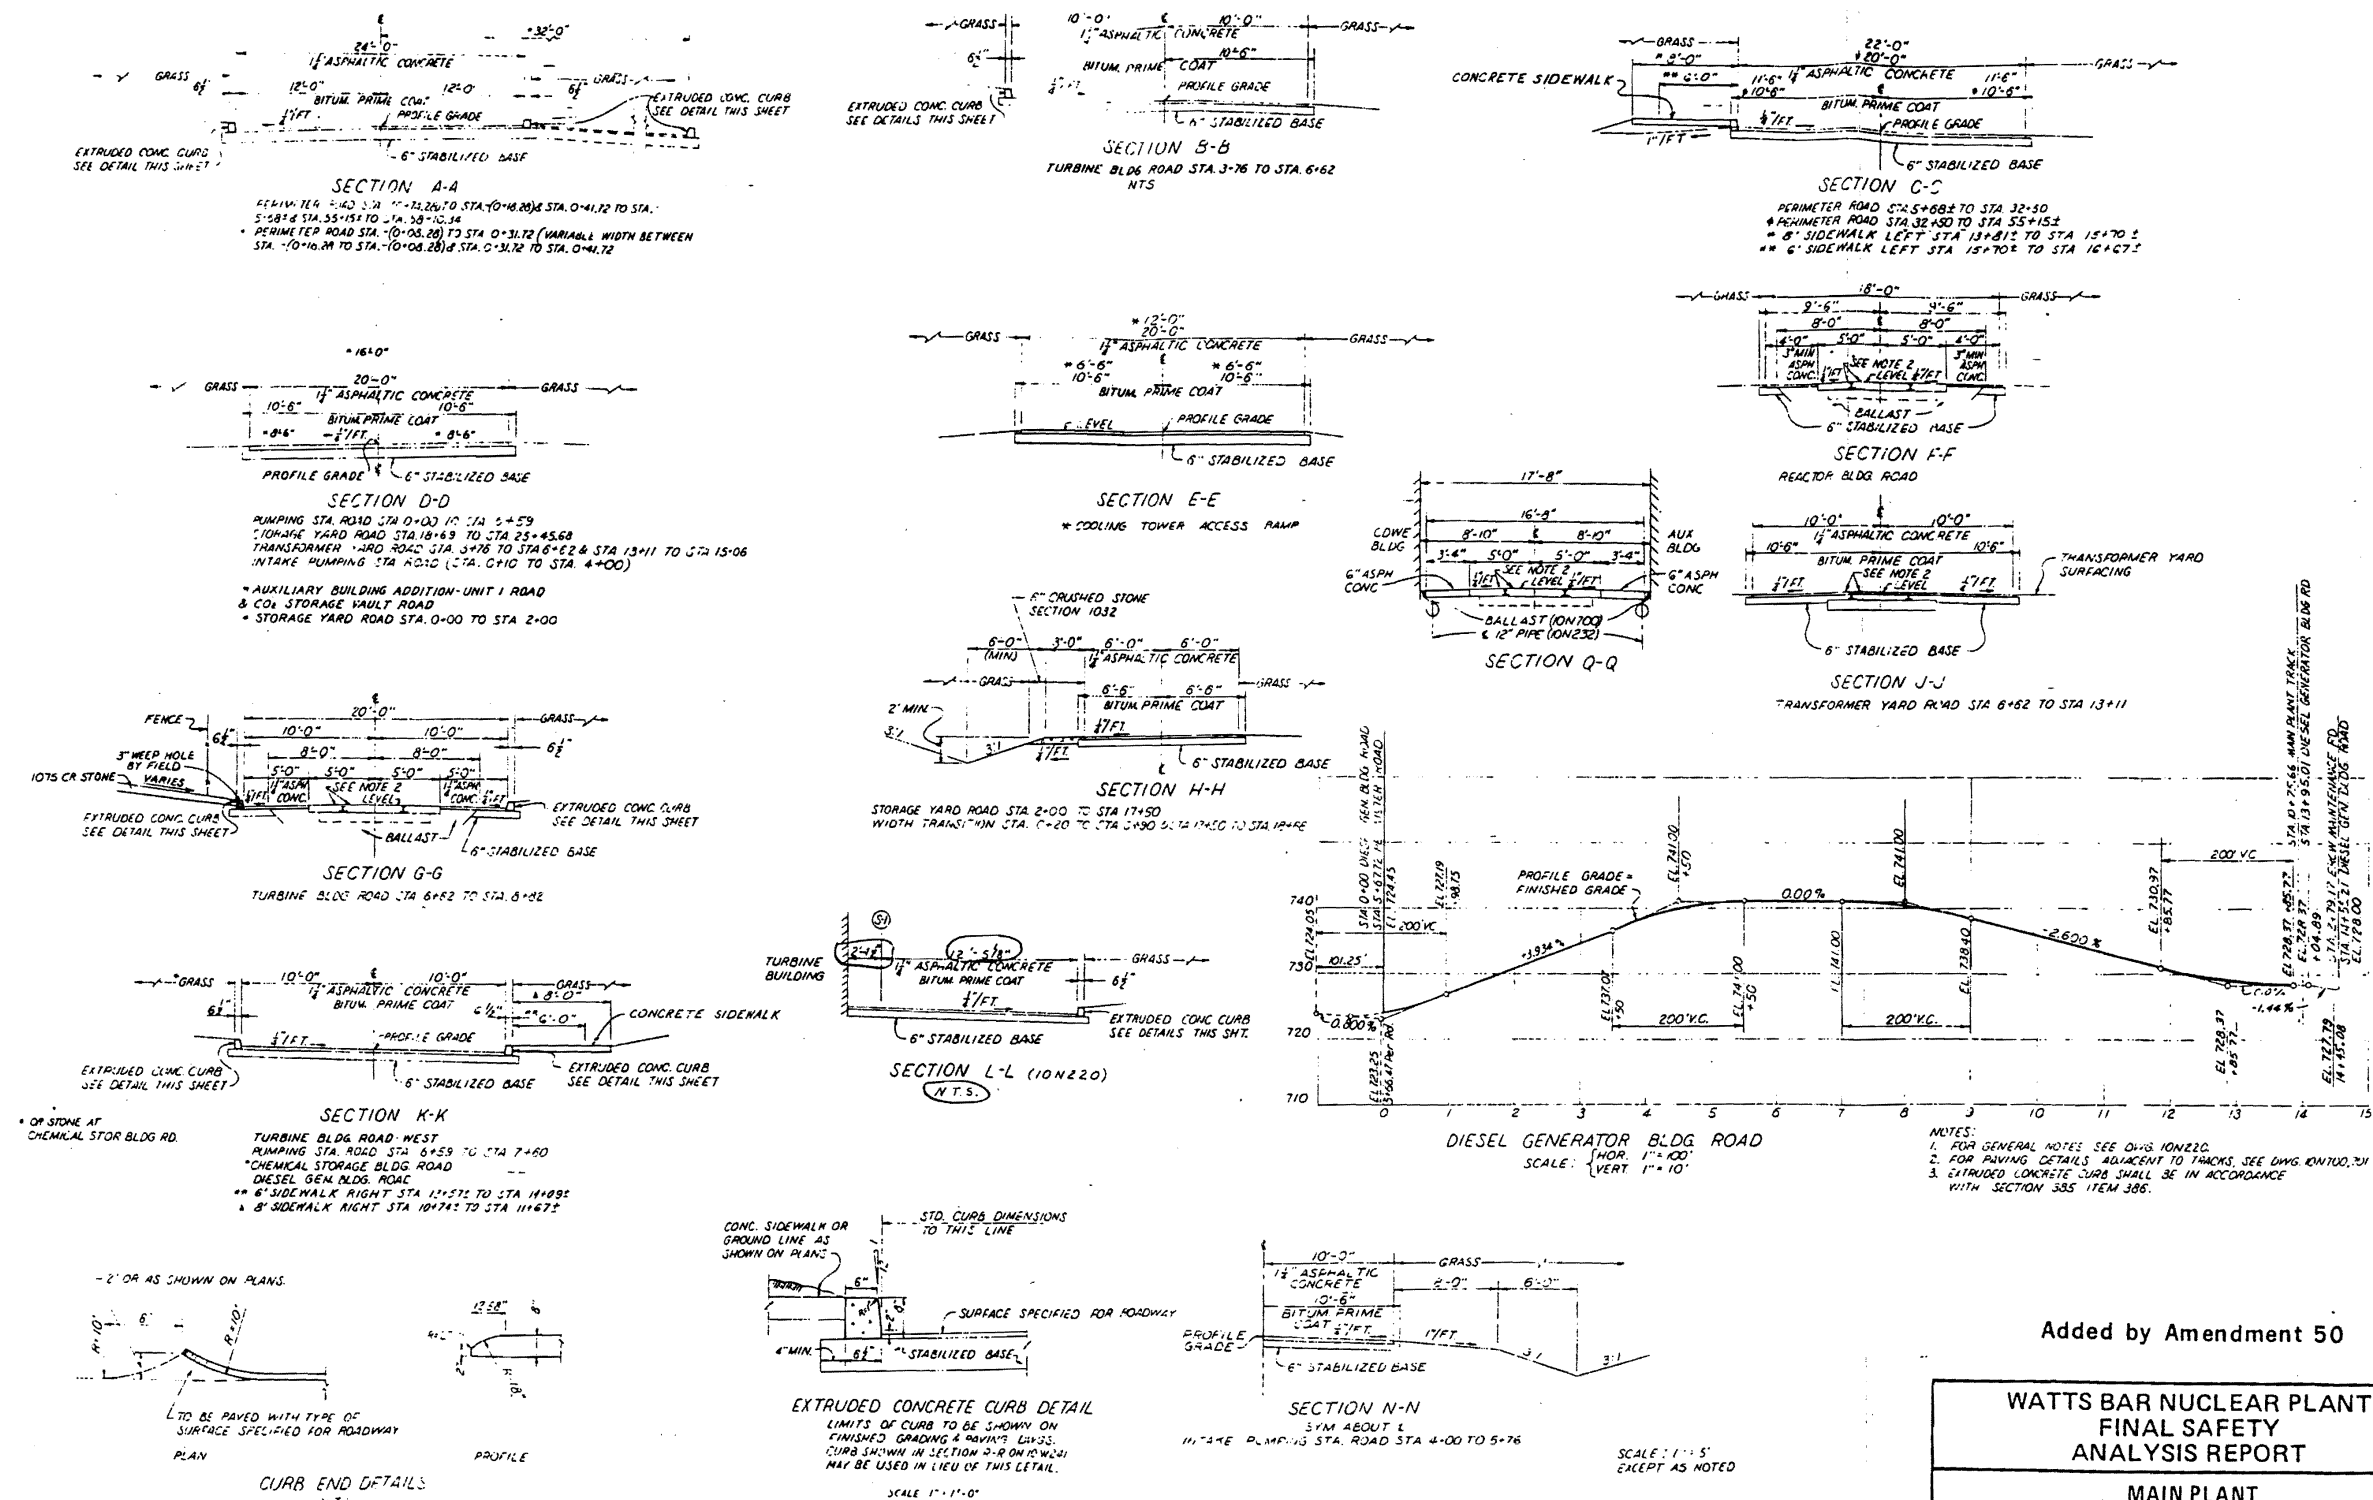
Main Plant Perimeter Roads Plan and Profile - Sheet 2
